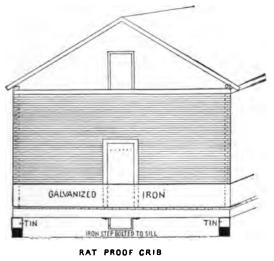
RAT-PROOF CORNCRIB (ELEVATION).
